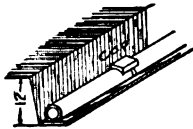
Manner of laying tile for subsurface sewage disposal. Note the open joint and method of covering.
